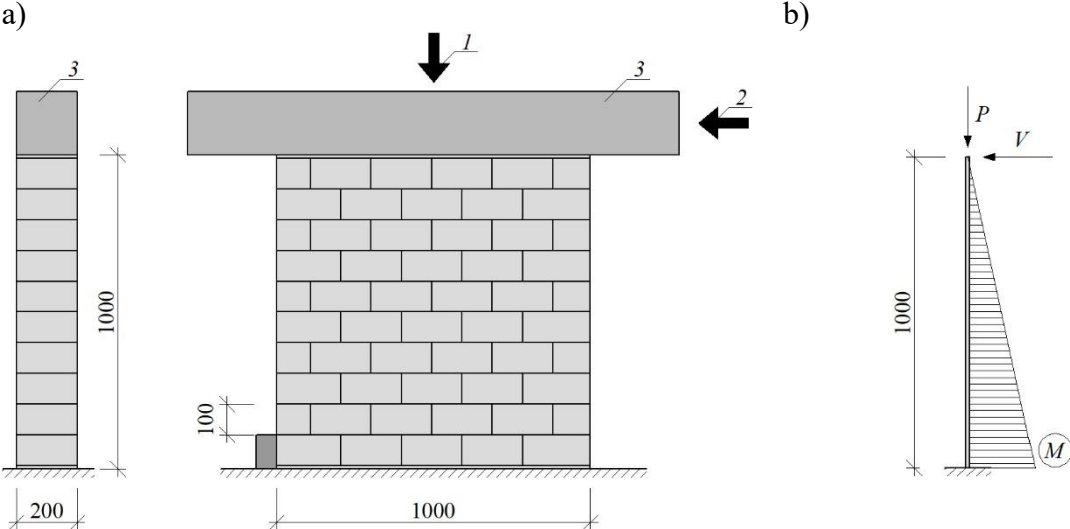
Details of research [103]: a) geometry and test stand, b) static cantilever scheme: 1 – vertical load, 2 – horizontal load, 3 – reinforced concrete beam,  $P$  – axial force,  $V$  – shear force
